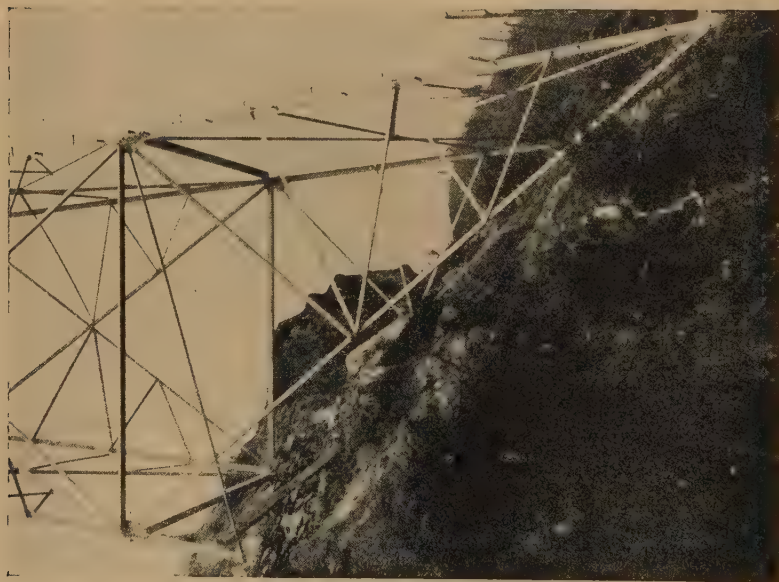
SPECIAL FORM OF TOWER EXTENSION FOR
